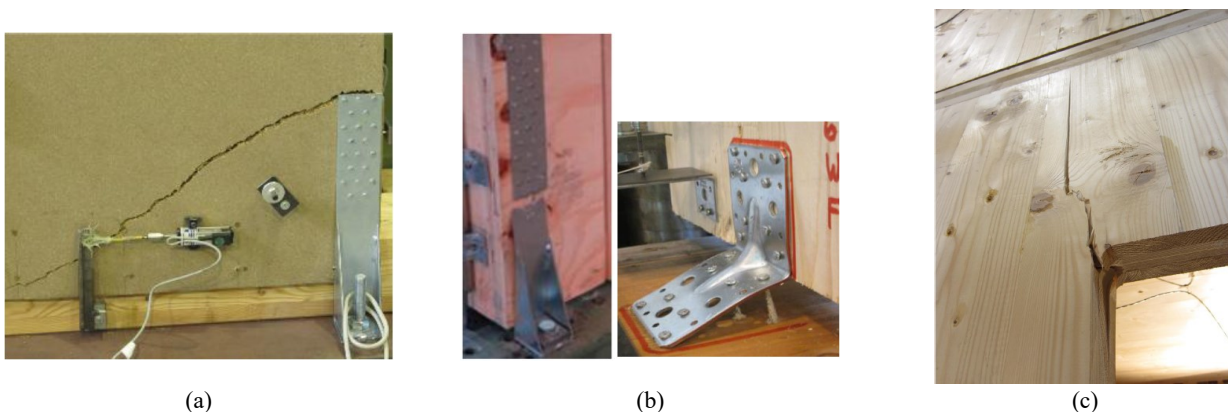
Example of brittle failures in timber shear-wall systems. (a) Failure of bracing panel in light-frame system [1.3]; (b) brittle failure of an hold-down and an angle bracket in CLT system [1.4]; (c) failure of timber lintel in CLT system [1.5].
